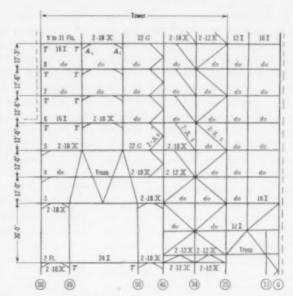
BENT L IN THE WALLS OF THE BANKING ROOM
